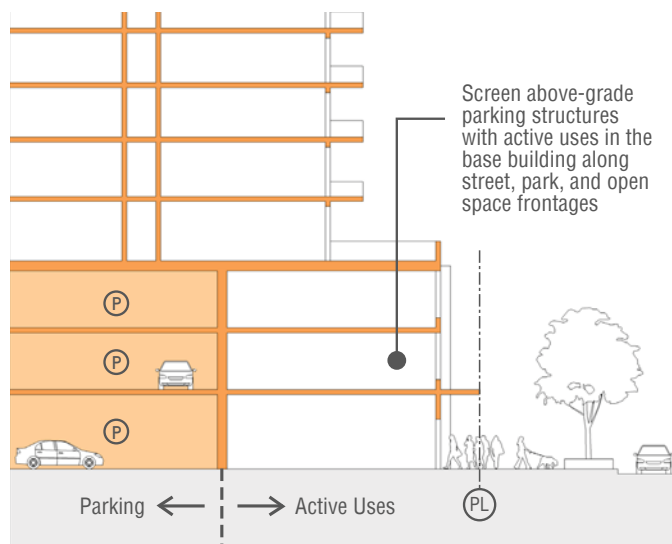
Above-grade parking structures lined with active, grade-related uses.
